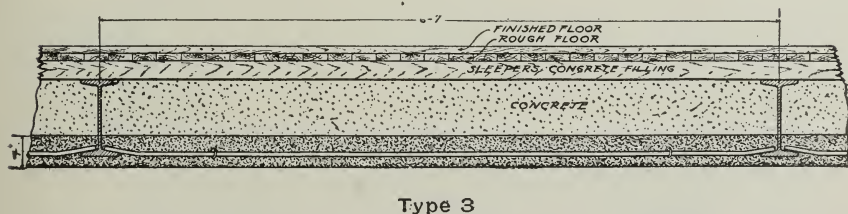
d. White Concrete Flat Ceiling Floor Arch, System E.
